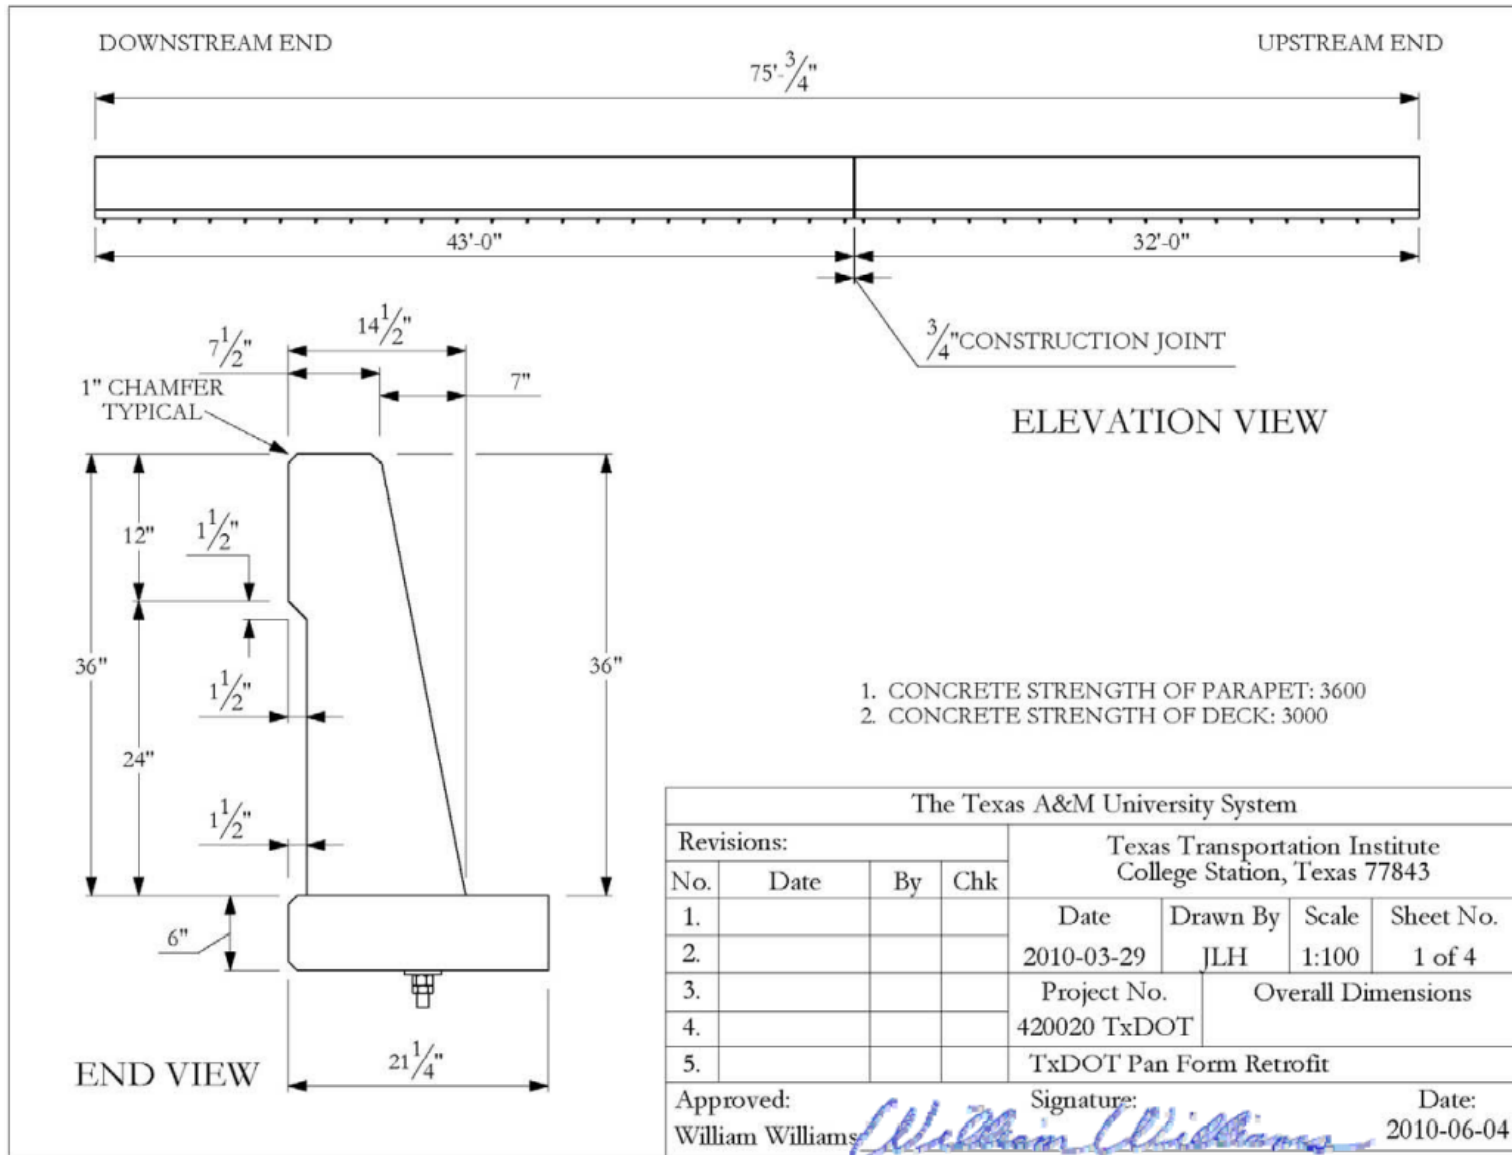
Design Drawings for TxDOT Pan Form Retrofit Bridge Rail [13]
